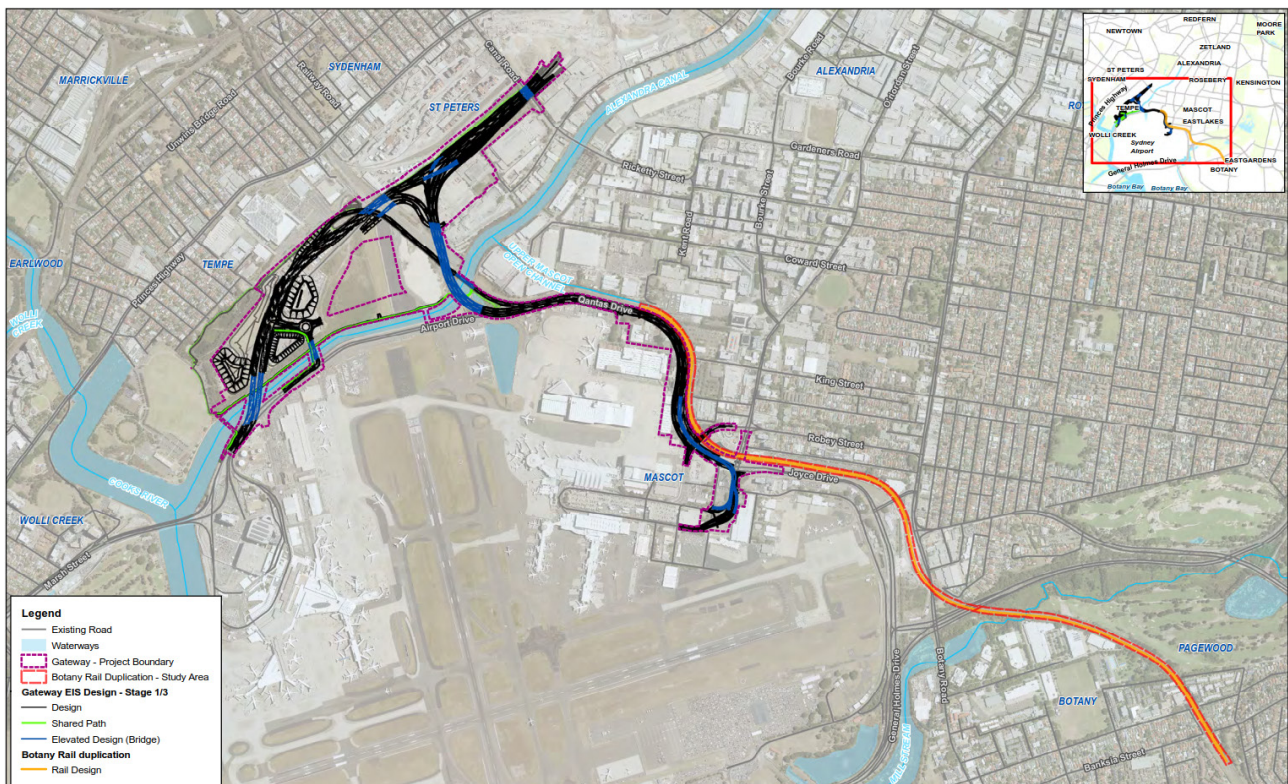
Gateway Road project and Botany Rail Duplication projects
